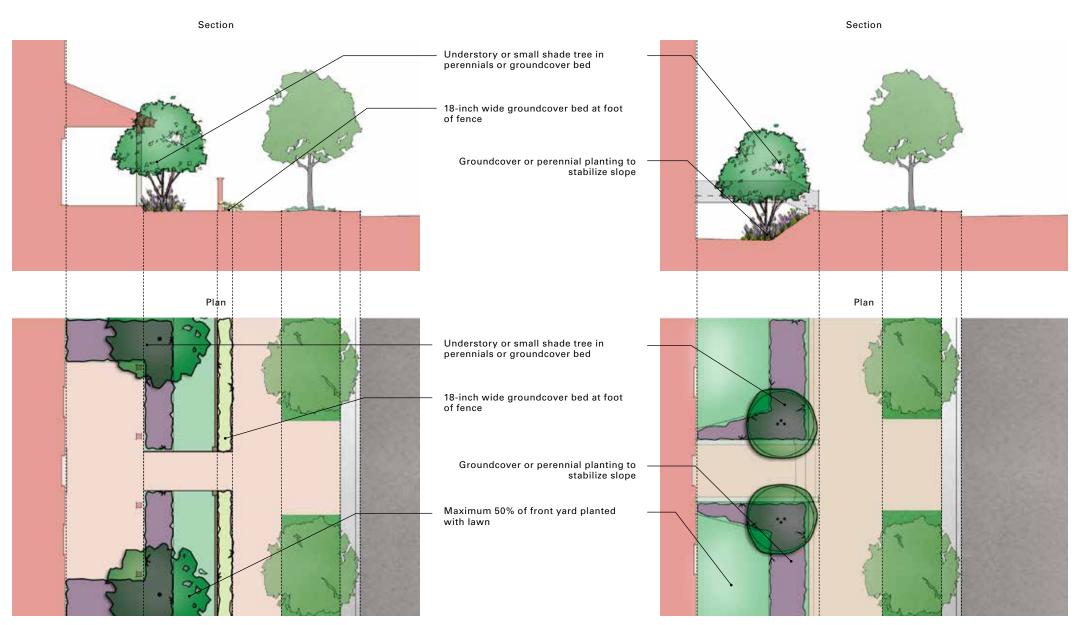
Typical residential frontage with fence showing proposed planting in plan and elevation
